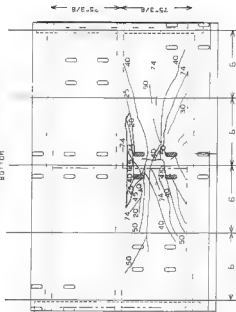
Bottom Cracking Pattern (Fourth Bridge - Test No 3)
